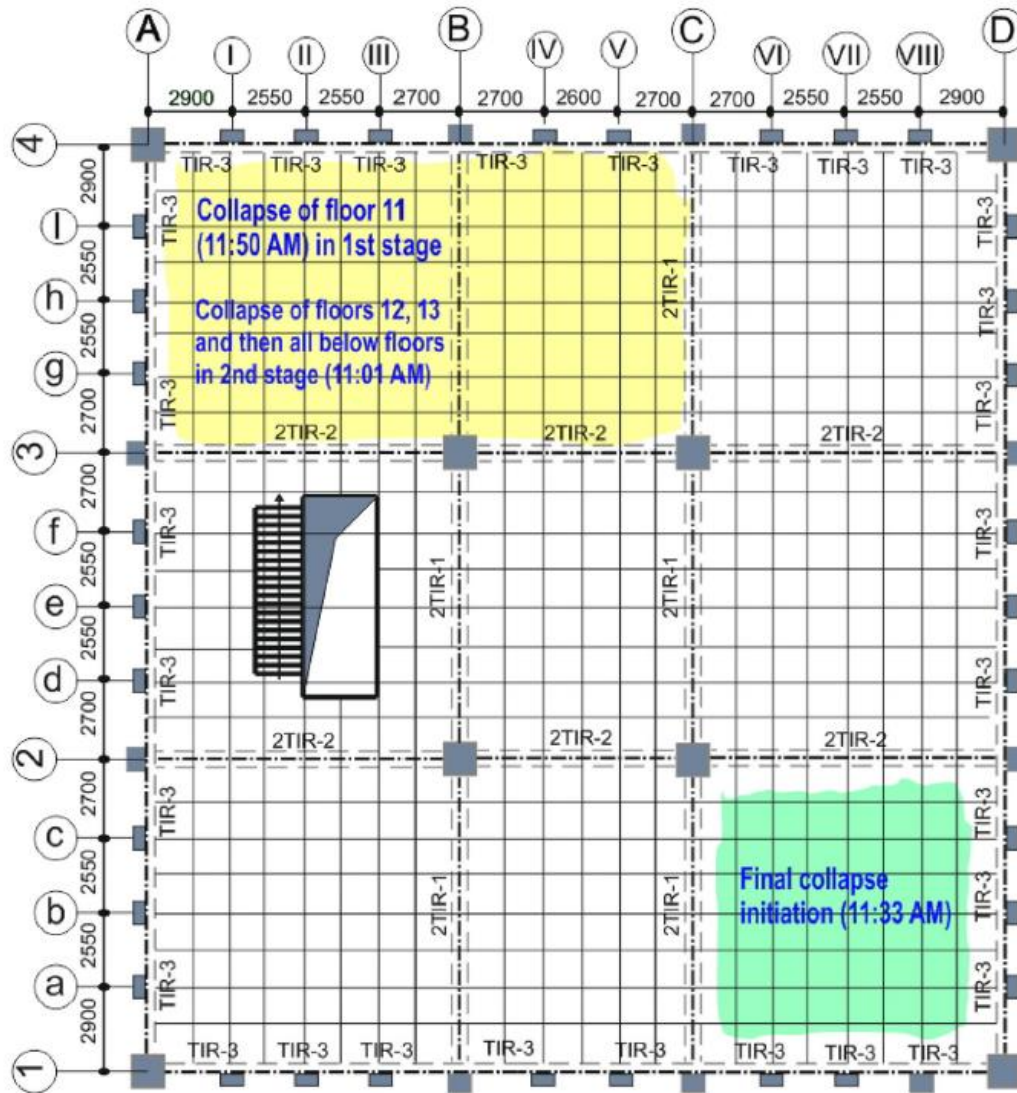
The floor plan of the tower indicates the stages of damage on different floors.
